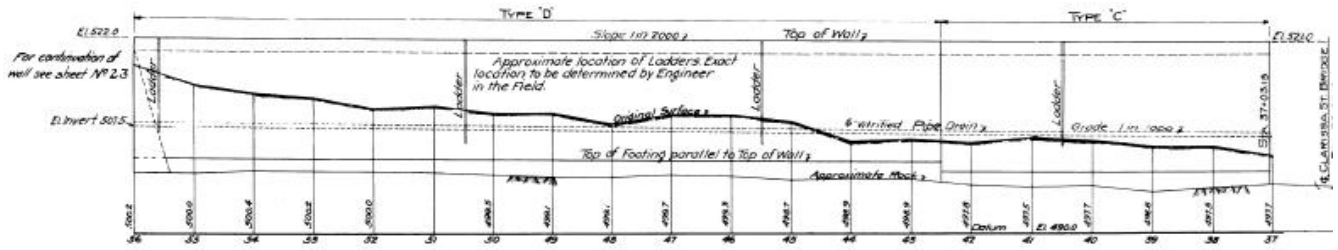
Elevation and Sections of Wall (from NYSCC Contract 59 Drawings – Appendix A)
